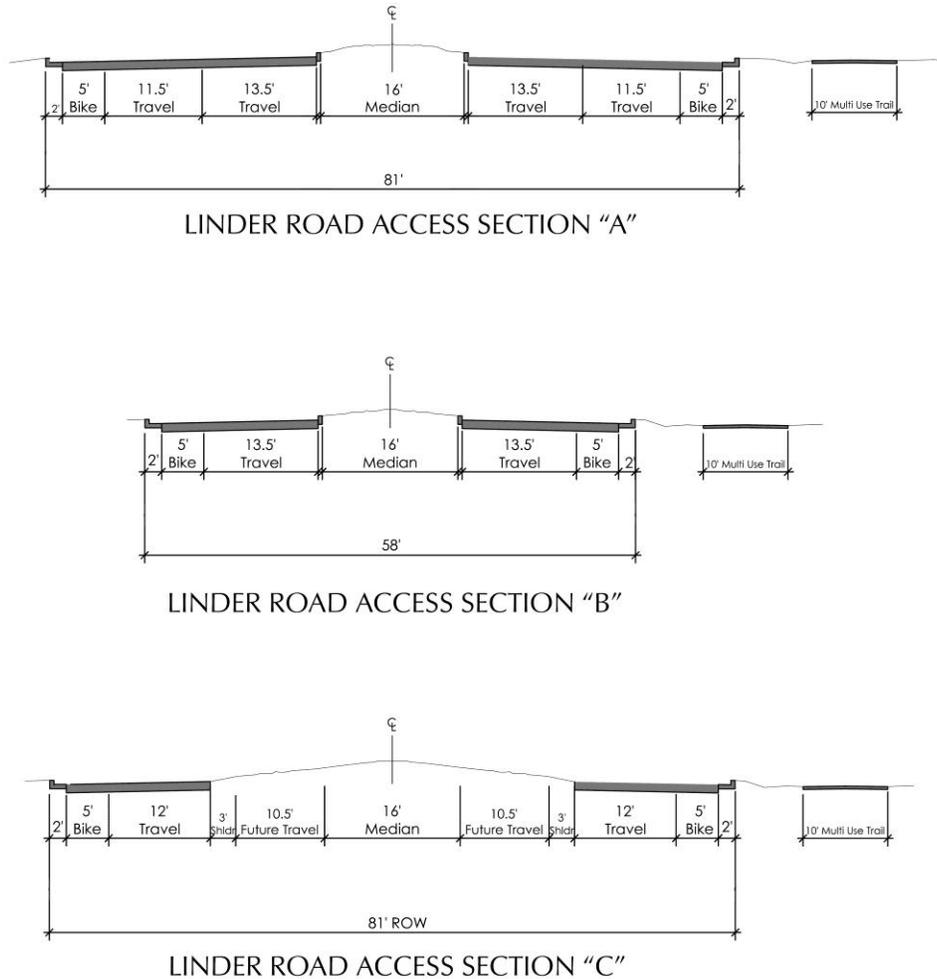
Cross-Sections of Linder Road Access ROW for the 4-lane (Sections A & C) and 2-lane (Section B) Scenarios – Alternative 2.
